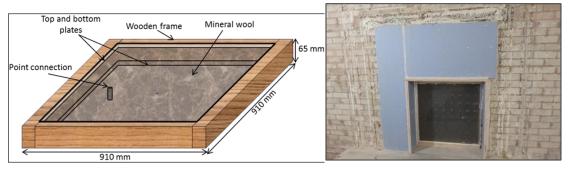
The dual leaf partition (grey) installed in a plasterboard structure with the filler wall (blue).
